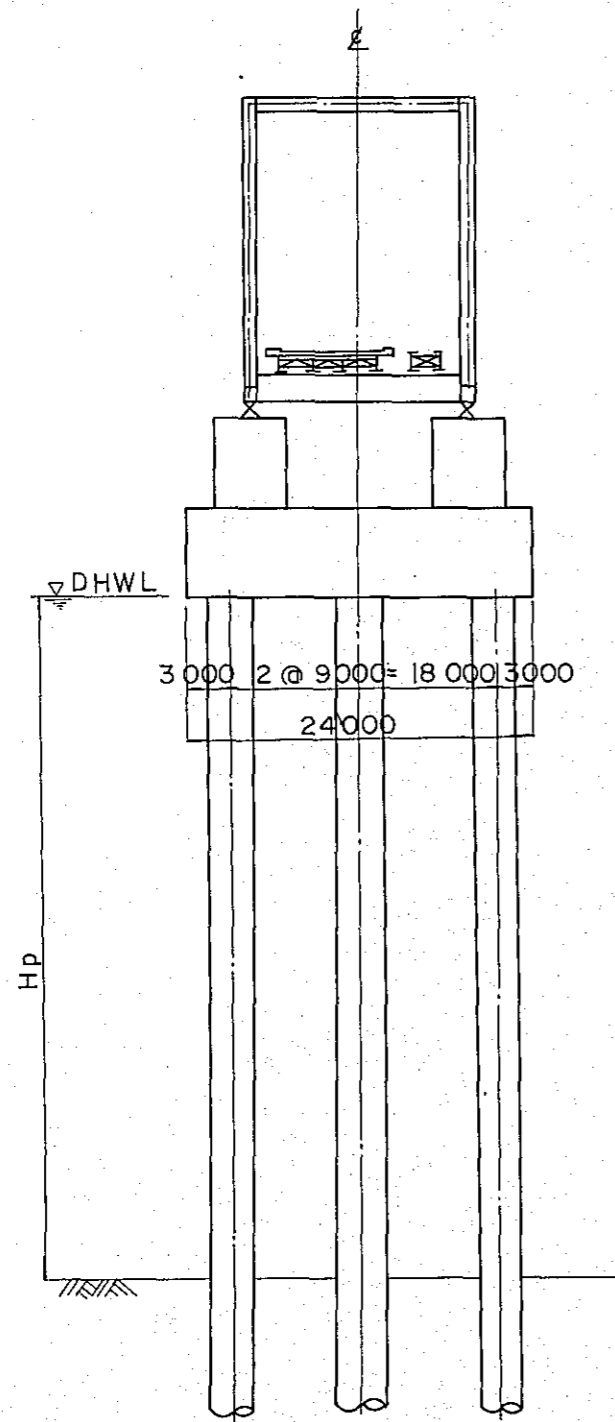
Outline of structure of multi-pile foundation ϕ 3.0m
